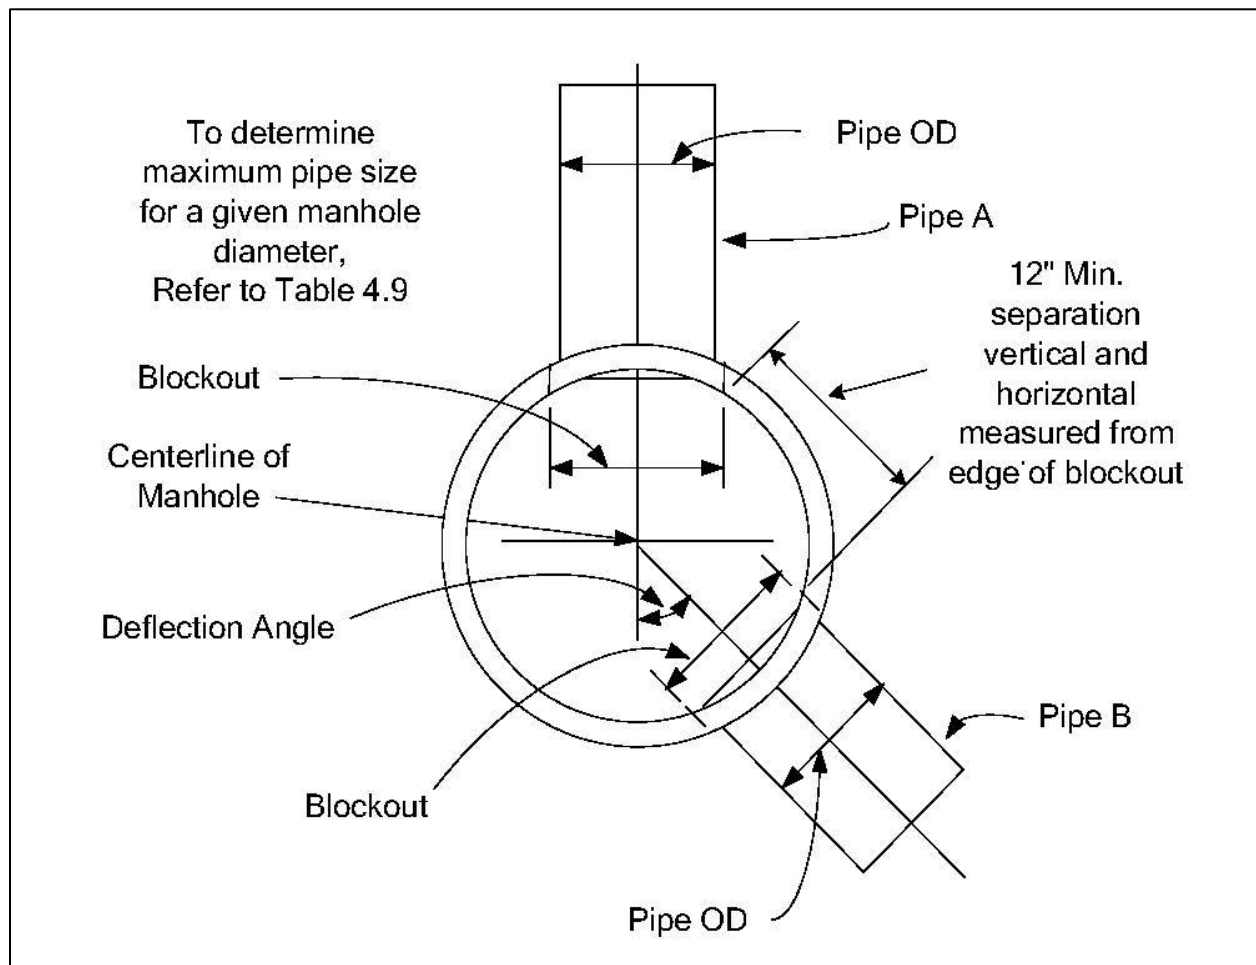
Minimum Precast Manhole Diameter for Maximum Sewer Sizes⁴³
